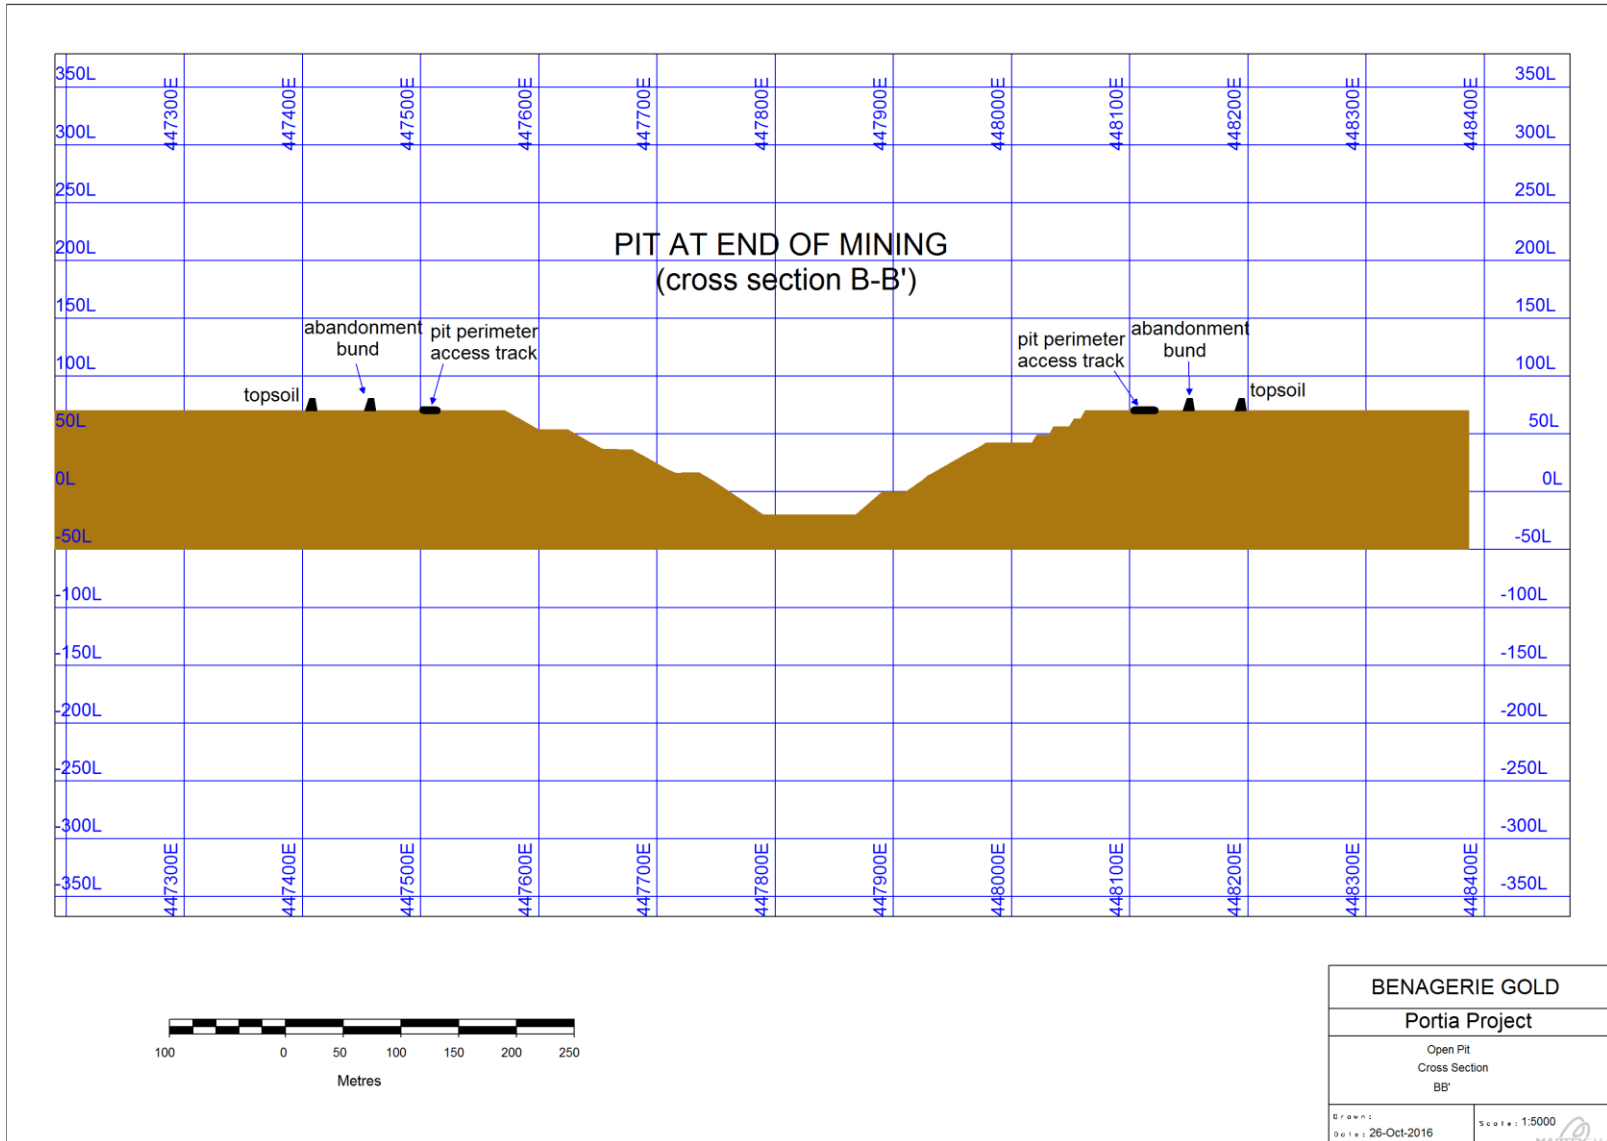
Cross-section B-B' of Portia Open Pit at End of Mining
